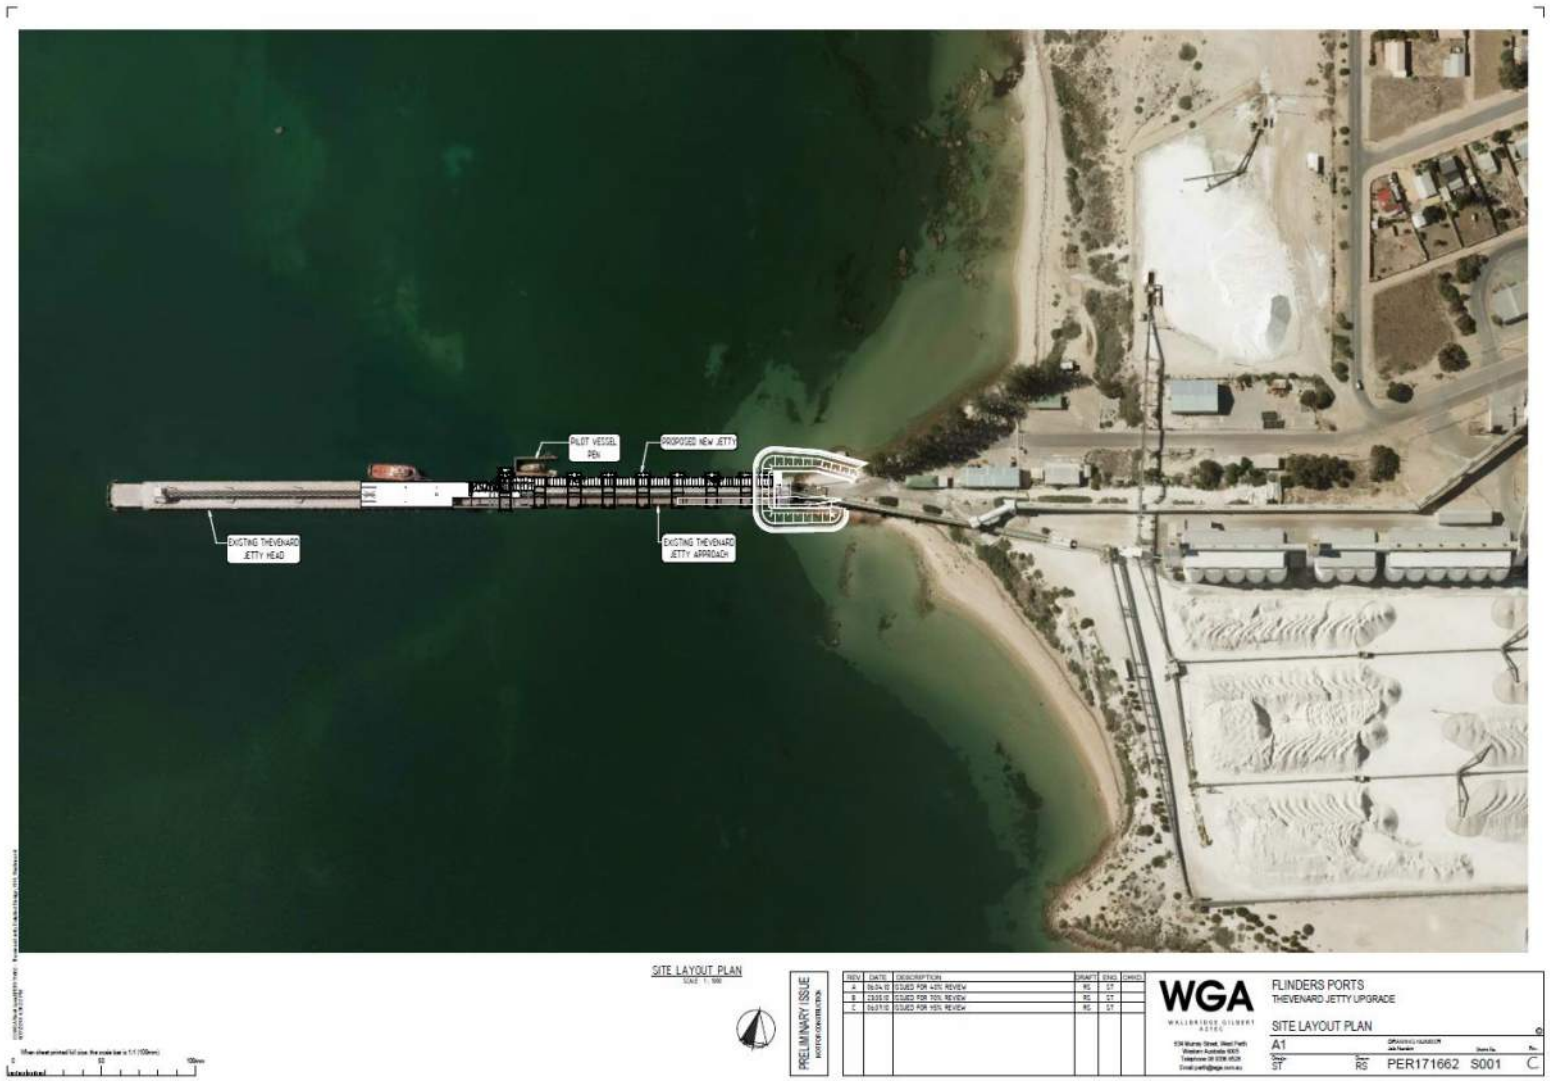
Jetty Upgrade Site Layout Plan, showing rock groyne extension and proposed new jetty
